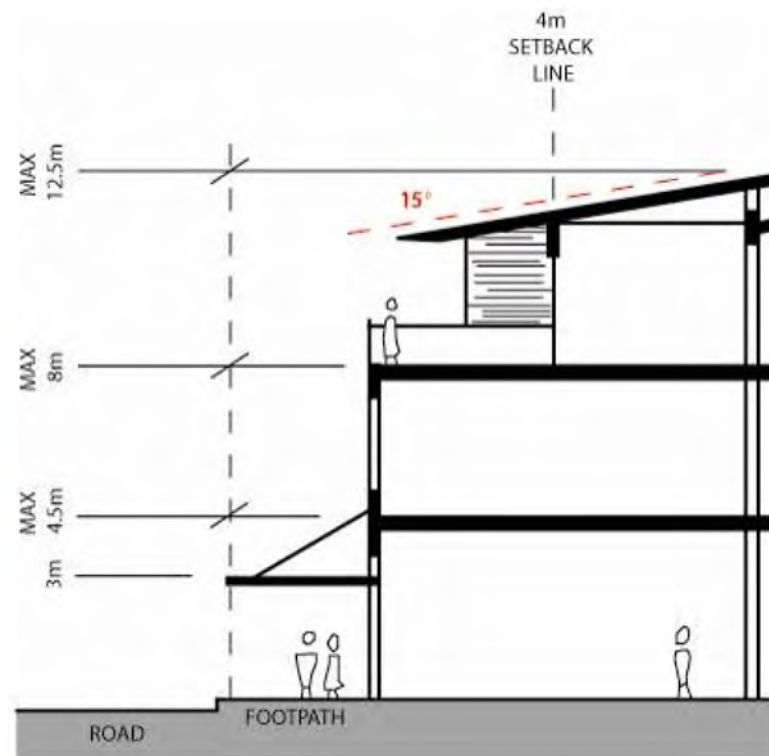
Typical three storey retail with office above and section illustrating building line setback at upper floor level to reduce the visual bulk of the built form on the street.
